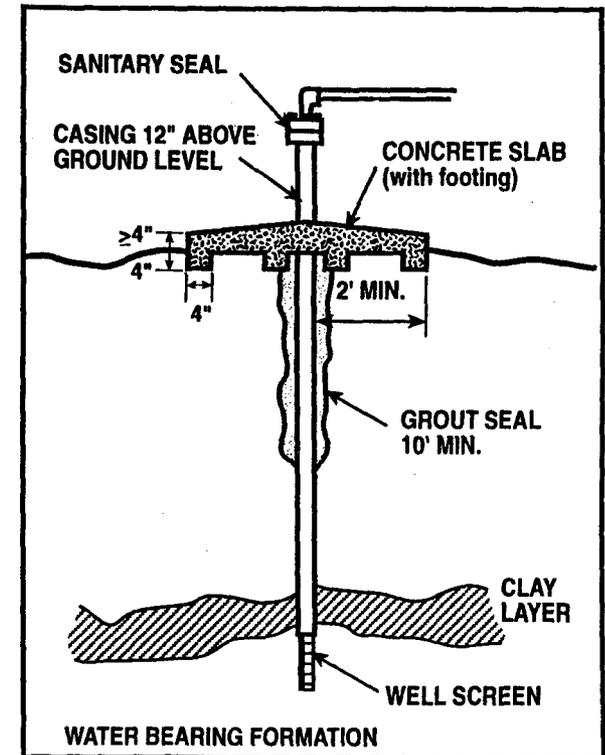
Cross sectional view of a typical well showing proper construction to prevent contamination
